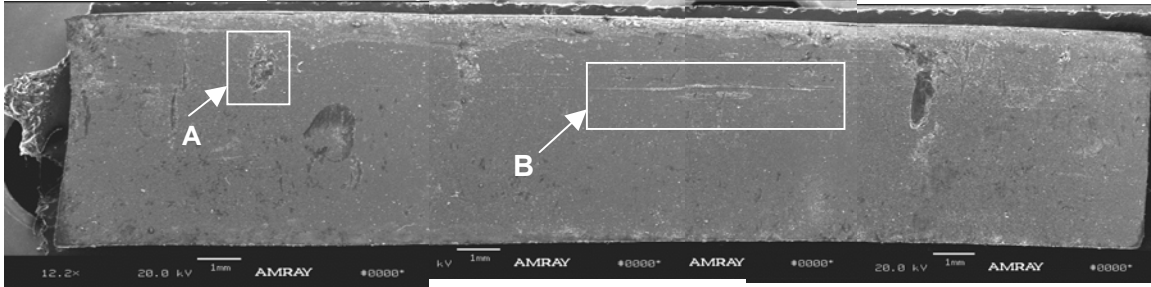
General view of the fracture surface of Specimen 1 from Span Sample 124-NB-T3-SEG4-N
